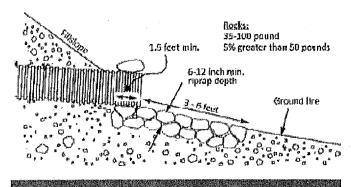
A. Riprap aimor at culvest outlet (Modified from: Kellar et al., 2011).
